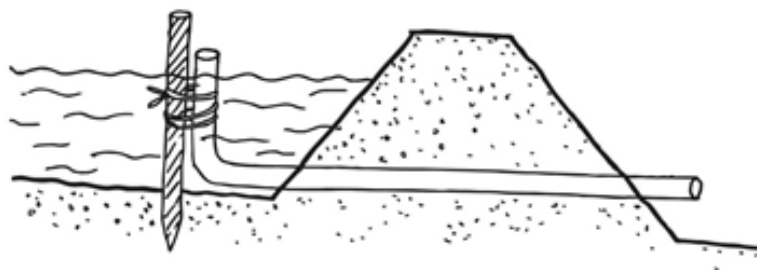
Outlet PVC pipe is set at the deepest part of the pond
